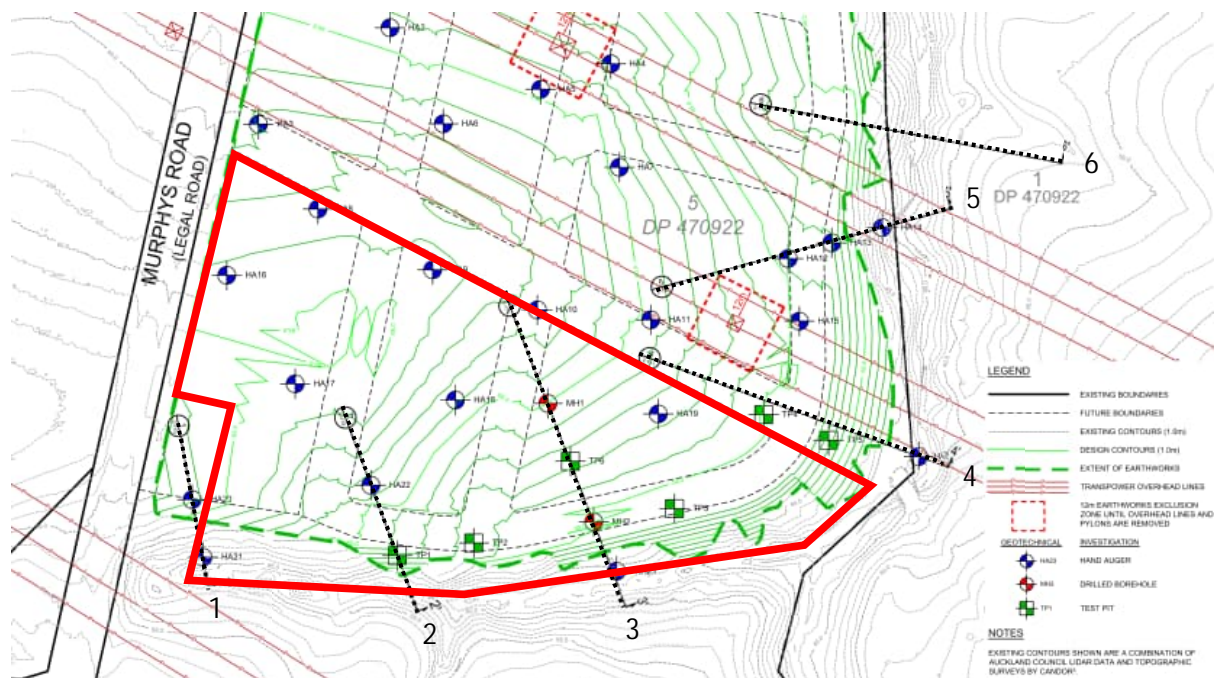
Geotechnical site investigation plan extracted from the Lander Geotechnical report.
